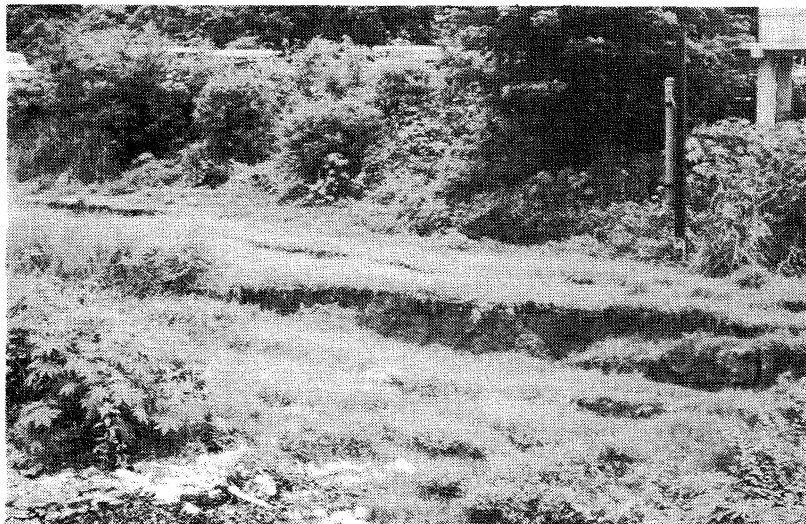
Slumping towards river channel, Carmen Bridge (north bank)
